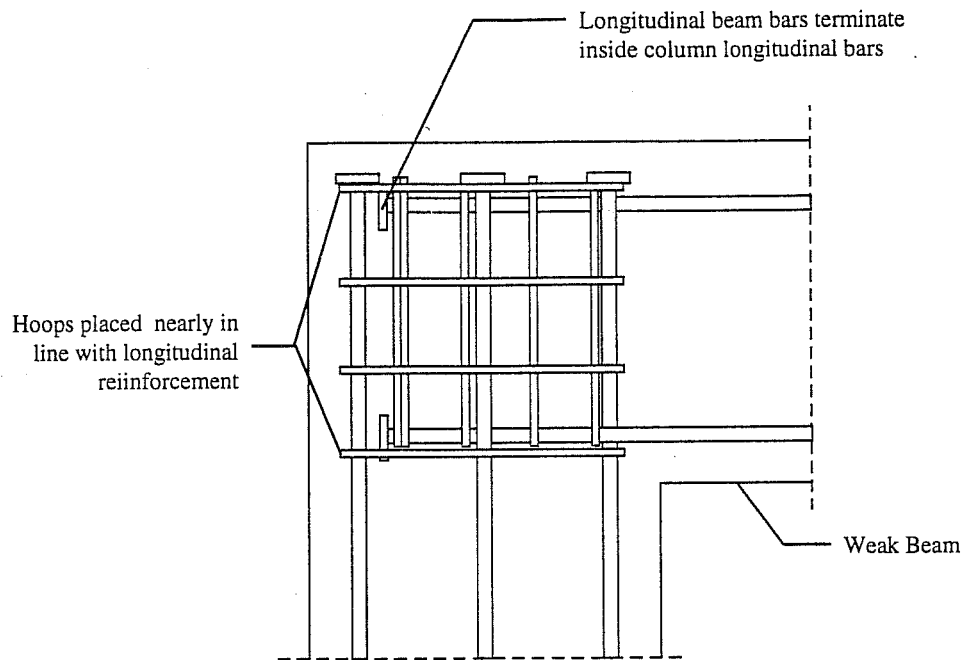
Recommended Reinforcement Detail - McConnell and Wallace [7]
